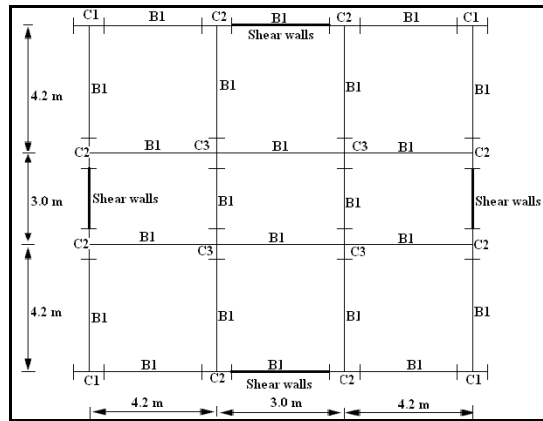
Plan of a G+6 Storey Building with steel plate shear walls
